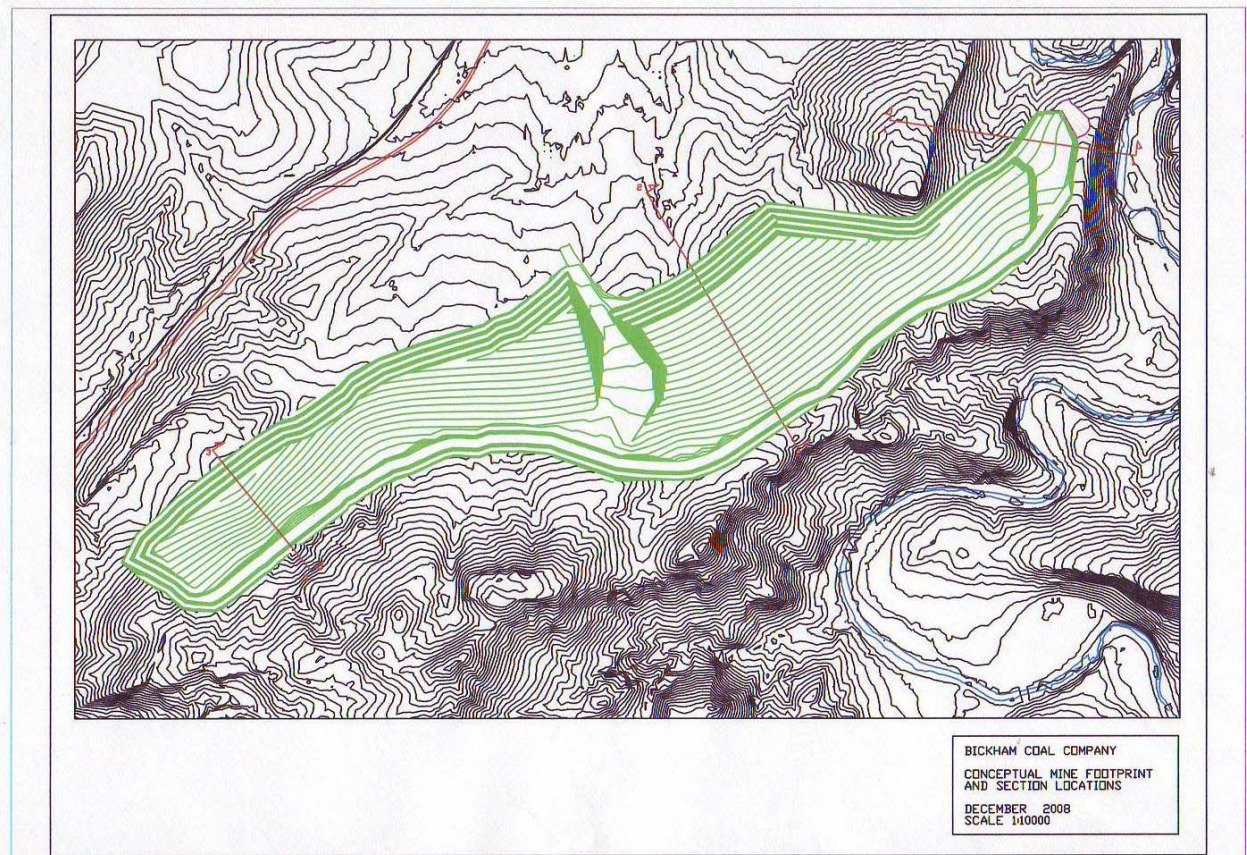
Pit shell for proposed Bickham Open Cut Mine
